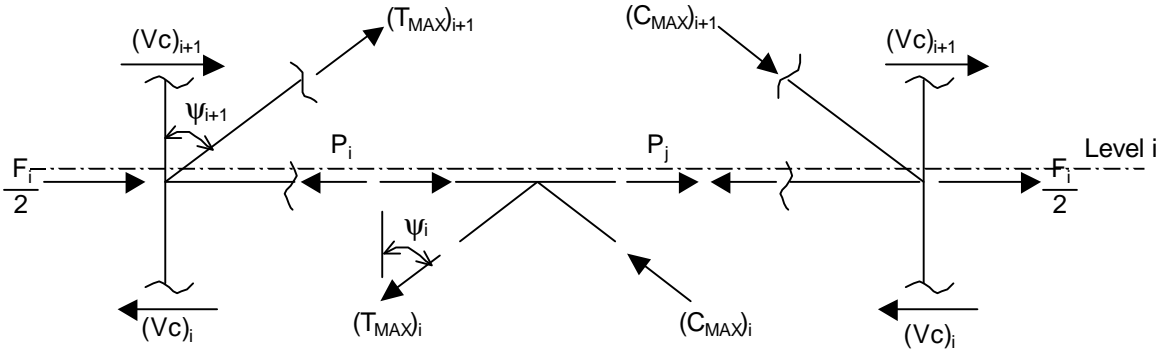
Required Axial Strengths of Second-Floor Beam per FEMA 450 Section 8.6.3.4.1.1
